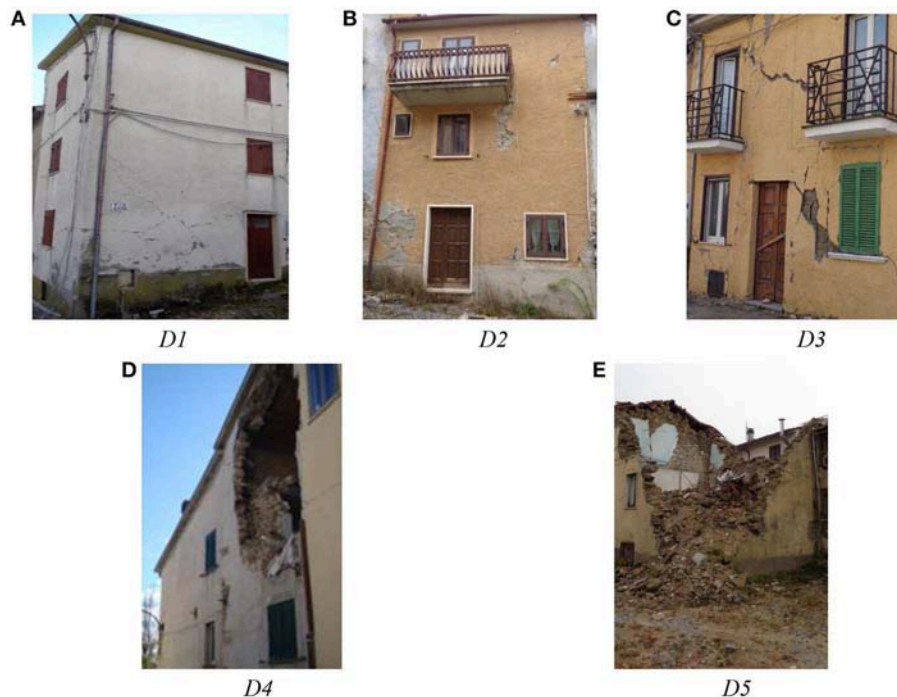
| Examples of the observed damage grades in Campotosto after the 2016 seismic event. (A) Negligible damage; (B) Moderate damage; (C) Substantial damage; (D) Serious damage; (E) Collapse.
